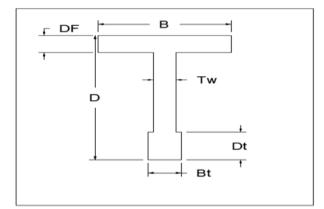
Cross Section of Pre-stressed Concrete Girder
